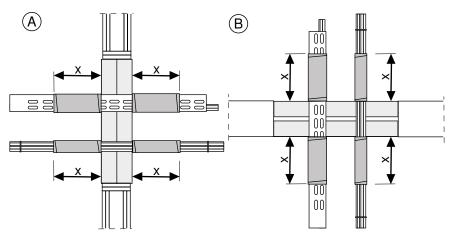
Fire protection bandage FSB-WB 1.5 on cables on wall and ceiling
